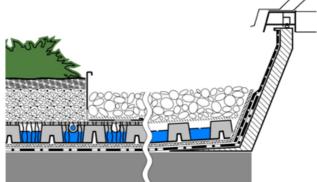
Skylight connection with a strip of filter sheet (not a Wicking Mat!)
